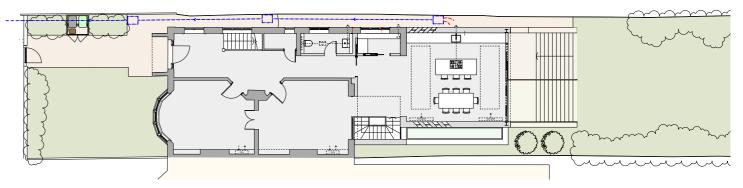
Proposed ground floor plan with existing drainage route shown in dashed blue line.
